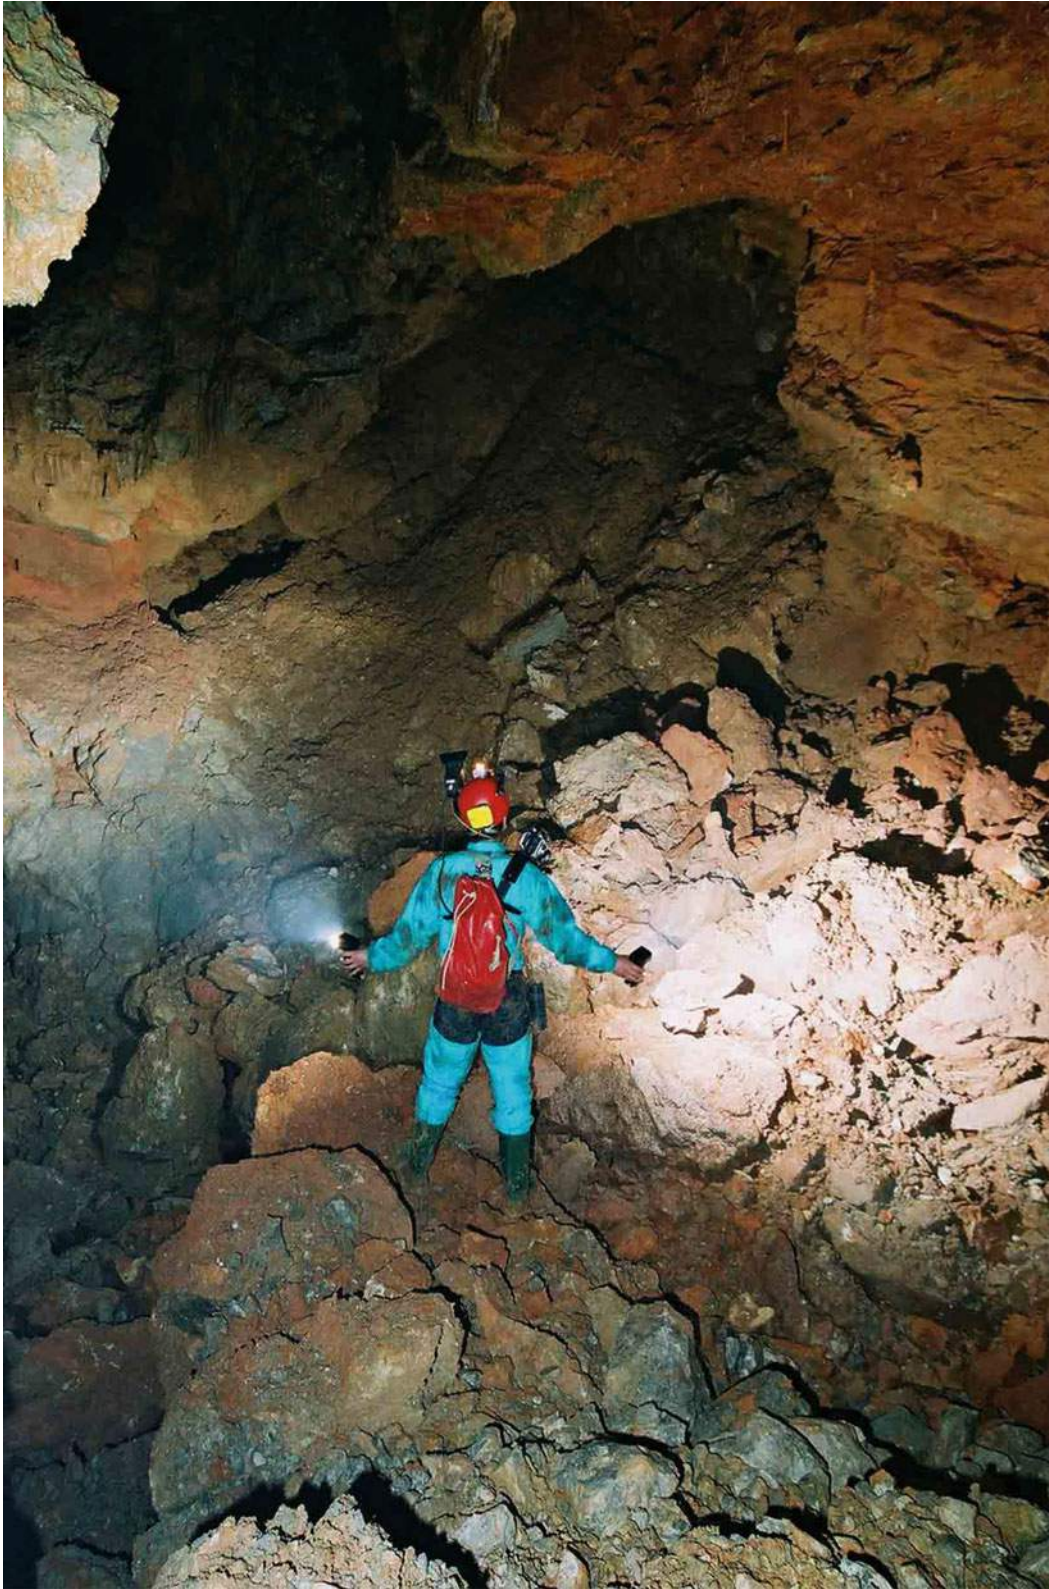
Cavern at km 14 + 300 in Brinje Tunnel
